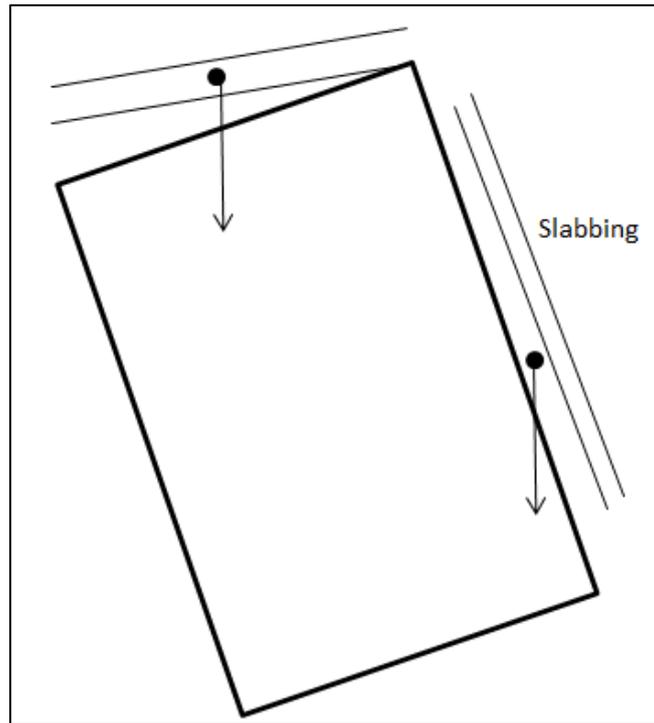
Slabbing is the mode of structural failure assumed in the study
